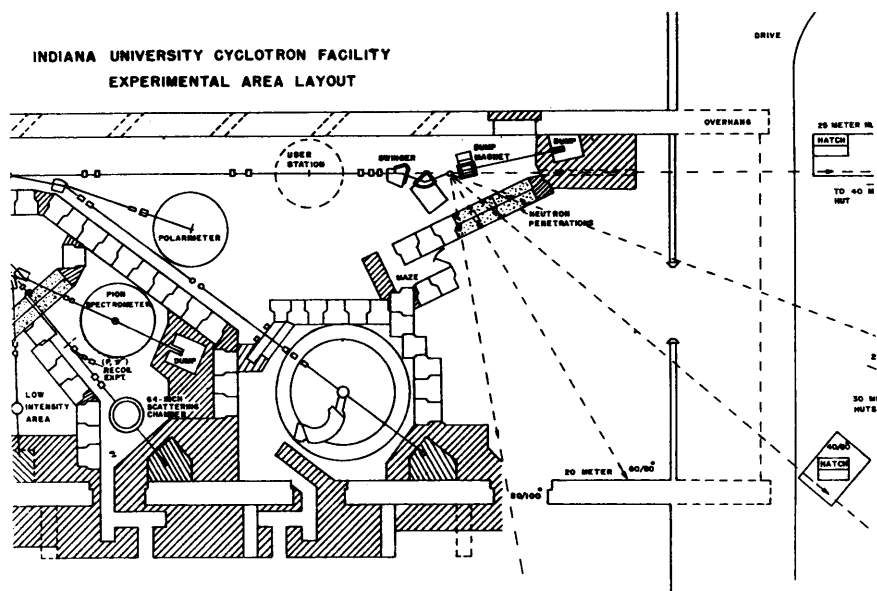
Floor plan for the beam swinger system. The long flight path stations will be outside the existing building.
